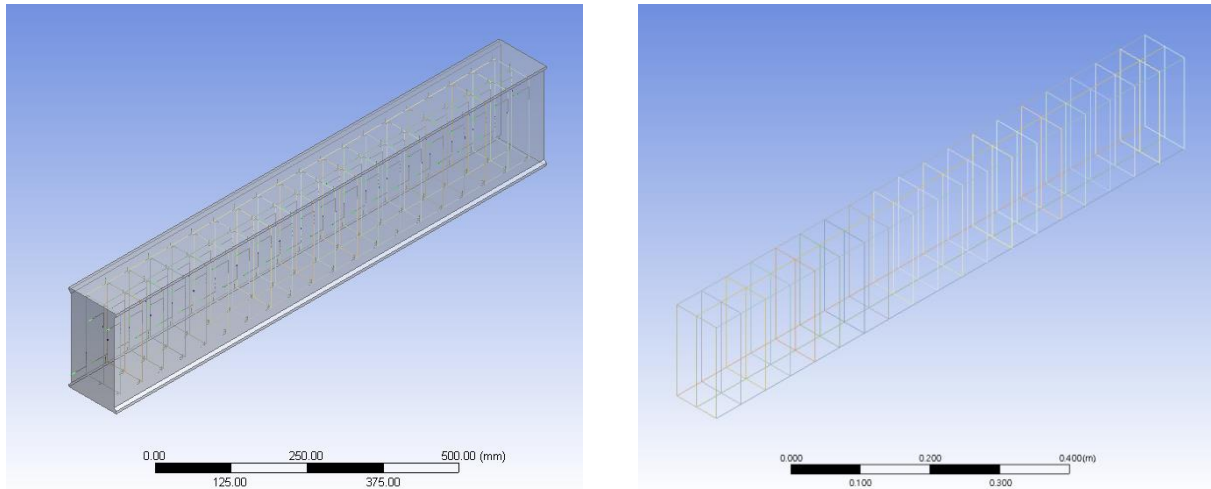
Study of Reinforced Concrete with Steel Bars in 3D Model.
